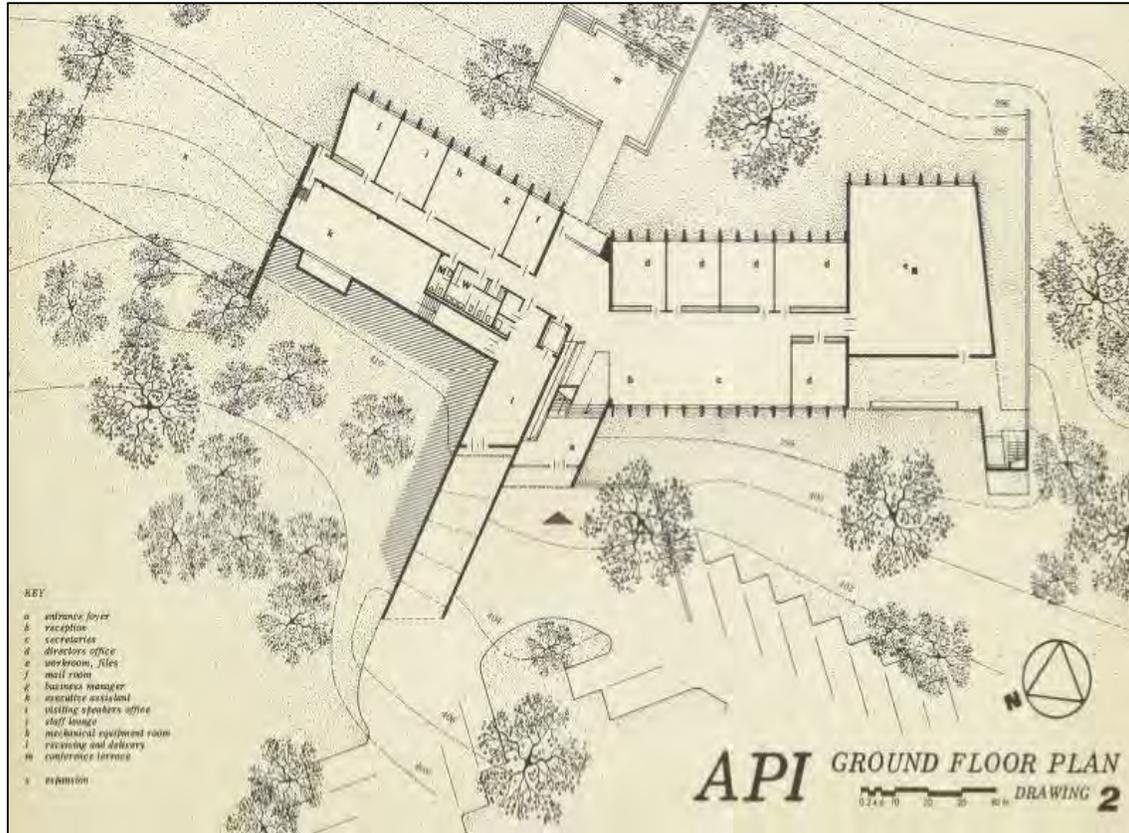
API Ground Floor Plan for Original Building (Marcel Breuer Digital Archives)
